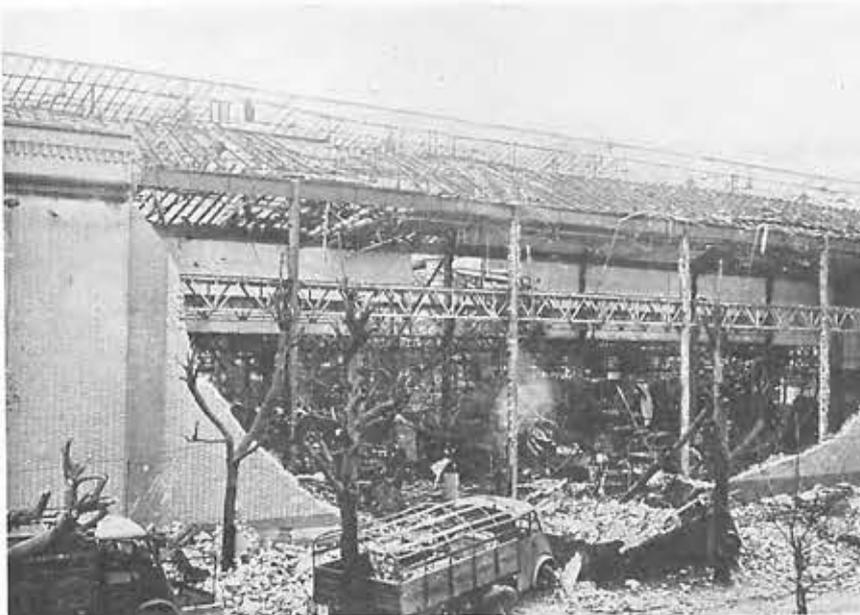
This damaged building in the Renault Factory clearly shows the construction of a typical single-storey workshop. Widely-spaced columns support the roof framework on heavy girders. A lattice girder below the eaves carries a gantry crane. The external "panel" wall has been demolished with little effect on the steel-framed structure. (Remnants of brickwork can be seen attached to the columns.) Reconstruction of this type of damage generally presents no serious problems.
